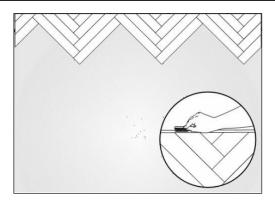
Put in spacers. Put in spacers between the flooring and the wall to ensure a expansion gap of 10/12 mm.
